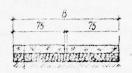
Pre-fab, concrete sidewalk pavement (type III)
